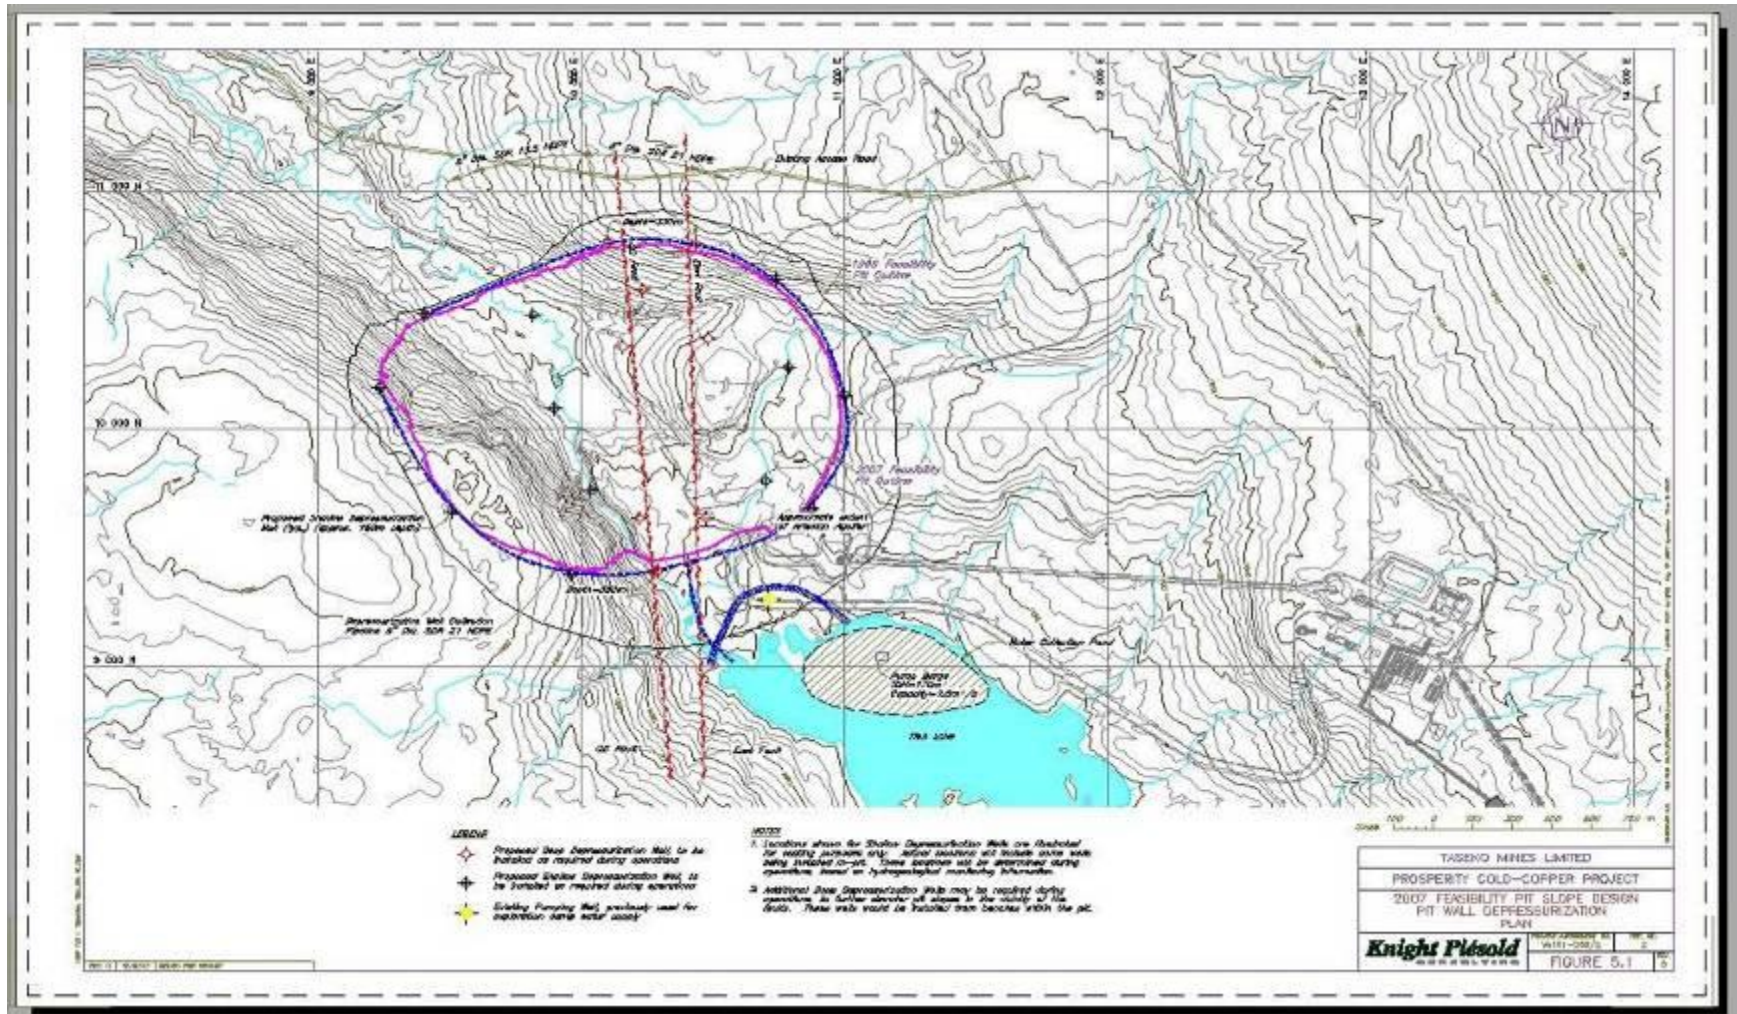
Pit Slope Design–Pit Wall Depressurization Plan
